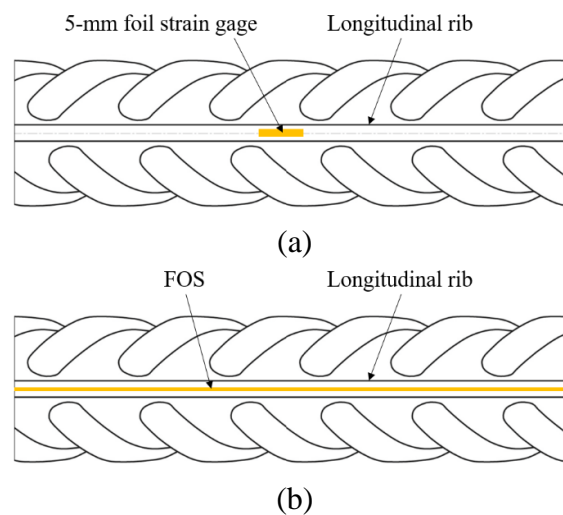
Location of instrumentation on the longitudinal rib of rebar: (a) 5-mm foil strain gage and (b) FOS
